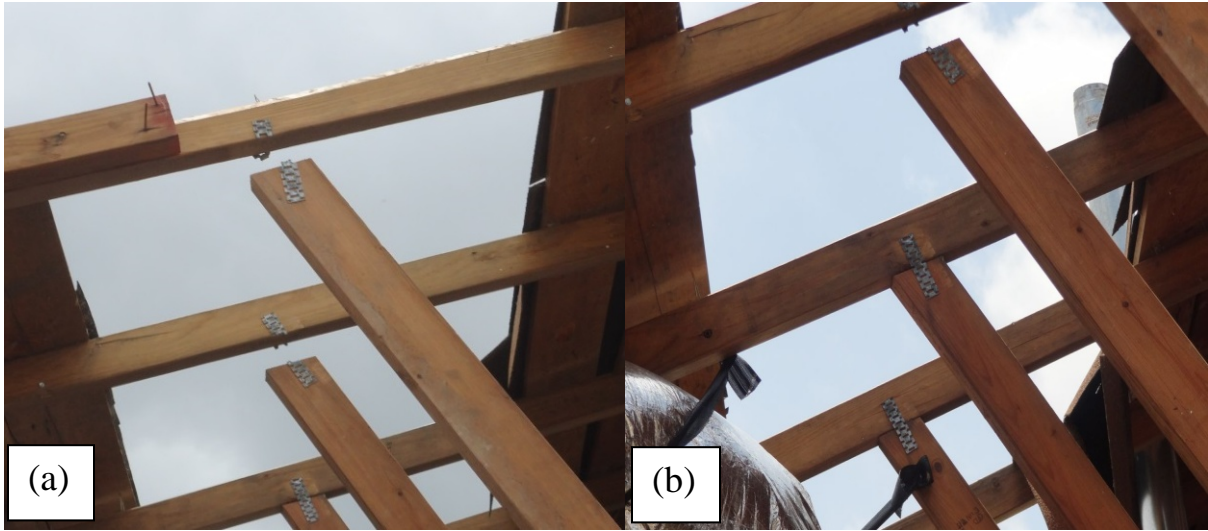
, Examples of (a) small truss connector plate failures at location indicated and (b) small connector plates that remained intact.
